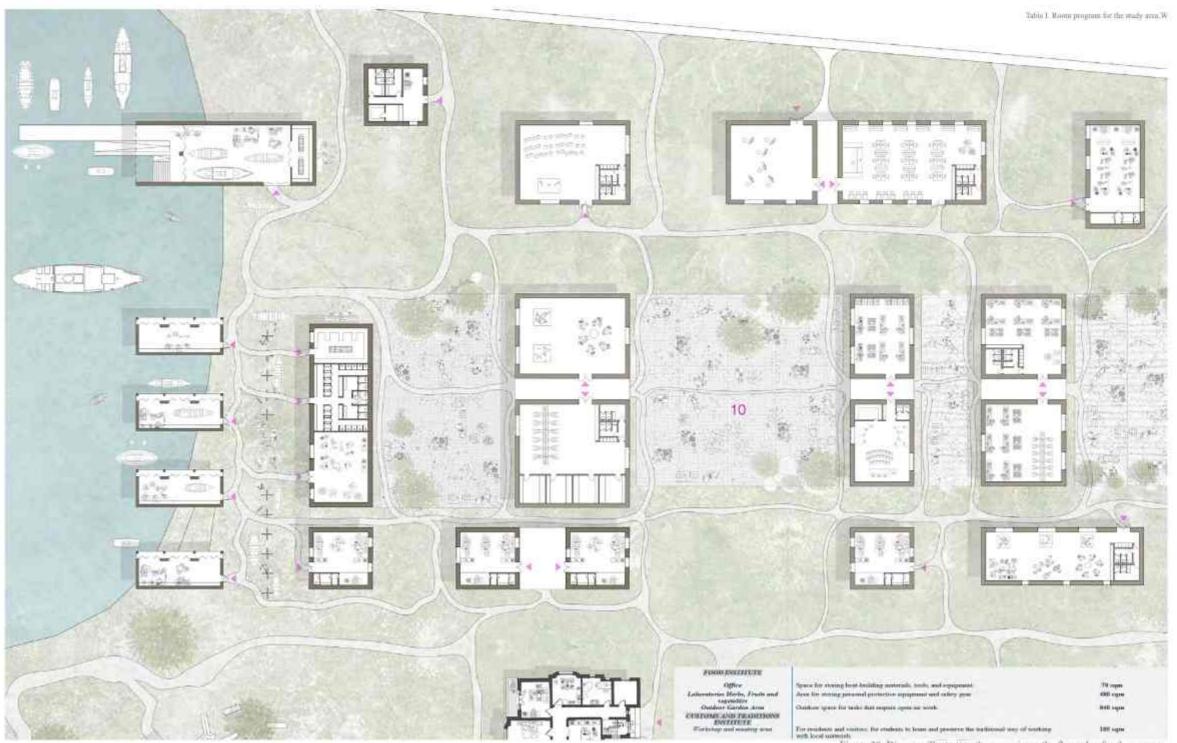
Diagram illustrating the zoom in on the floor plan for the campus.
